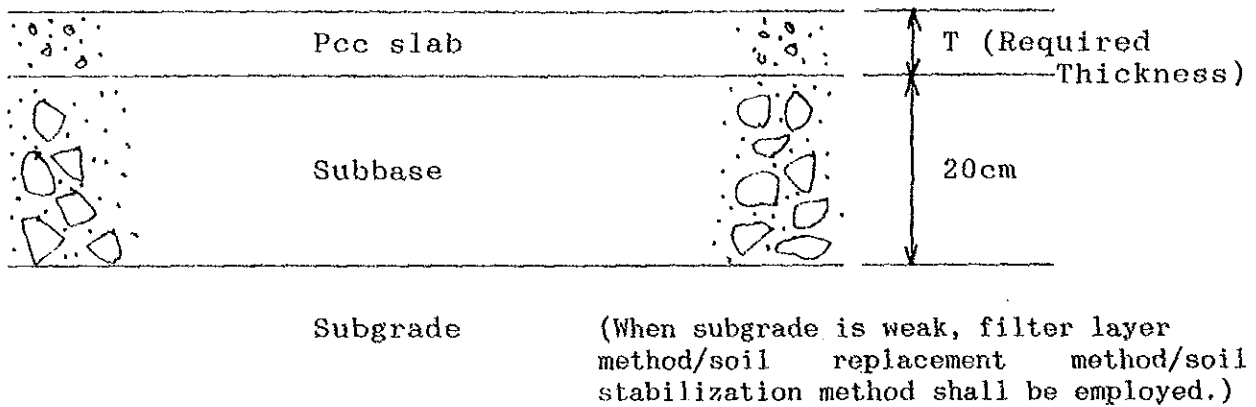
TYPICAL CROSS SECTION OF PCC PAVEMENT
